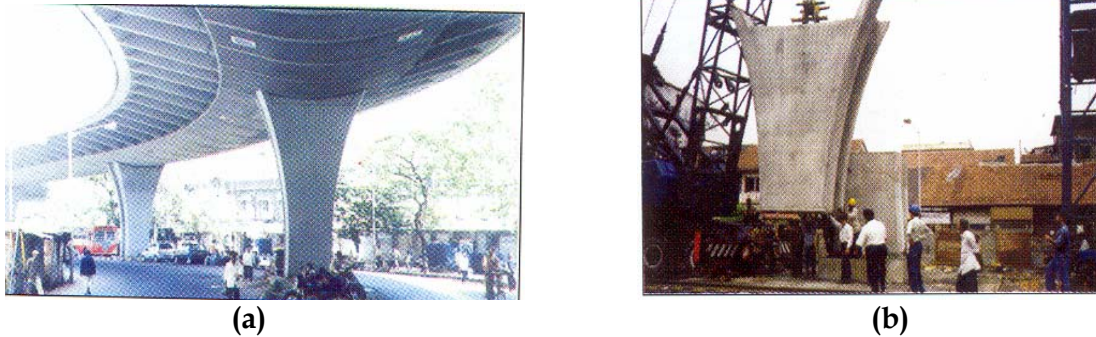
Massive Pre-cast Piers used for flyovers without disruption of underlying services and utilities: (a) JJ Hospital Flyover on Precast Piers in Delhi, and (b) Transportation of Precast Piers from site of construction to erection site (Bhattacharya, 2002)
